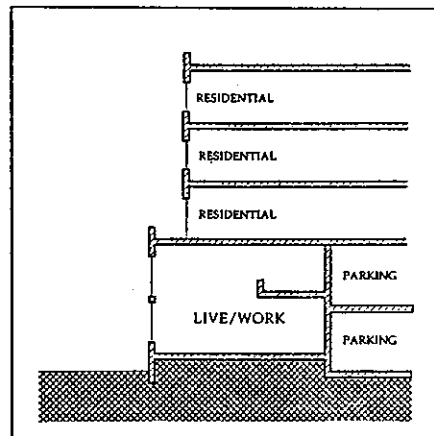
Live/work space should be encouraged for ground-floor frontages in residential projects.
